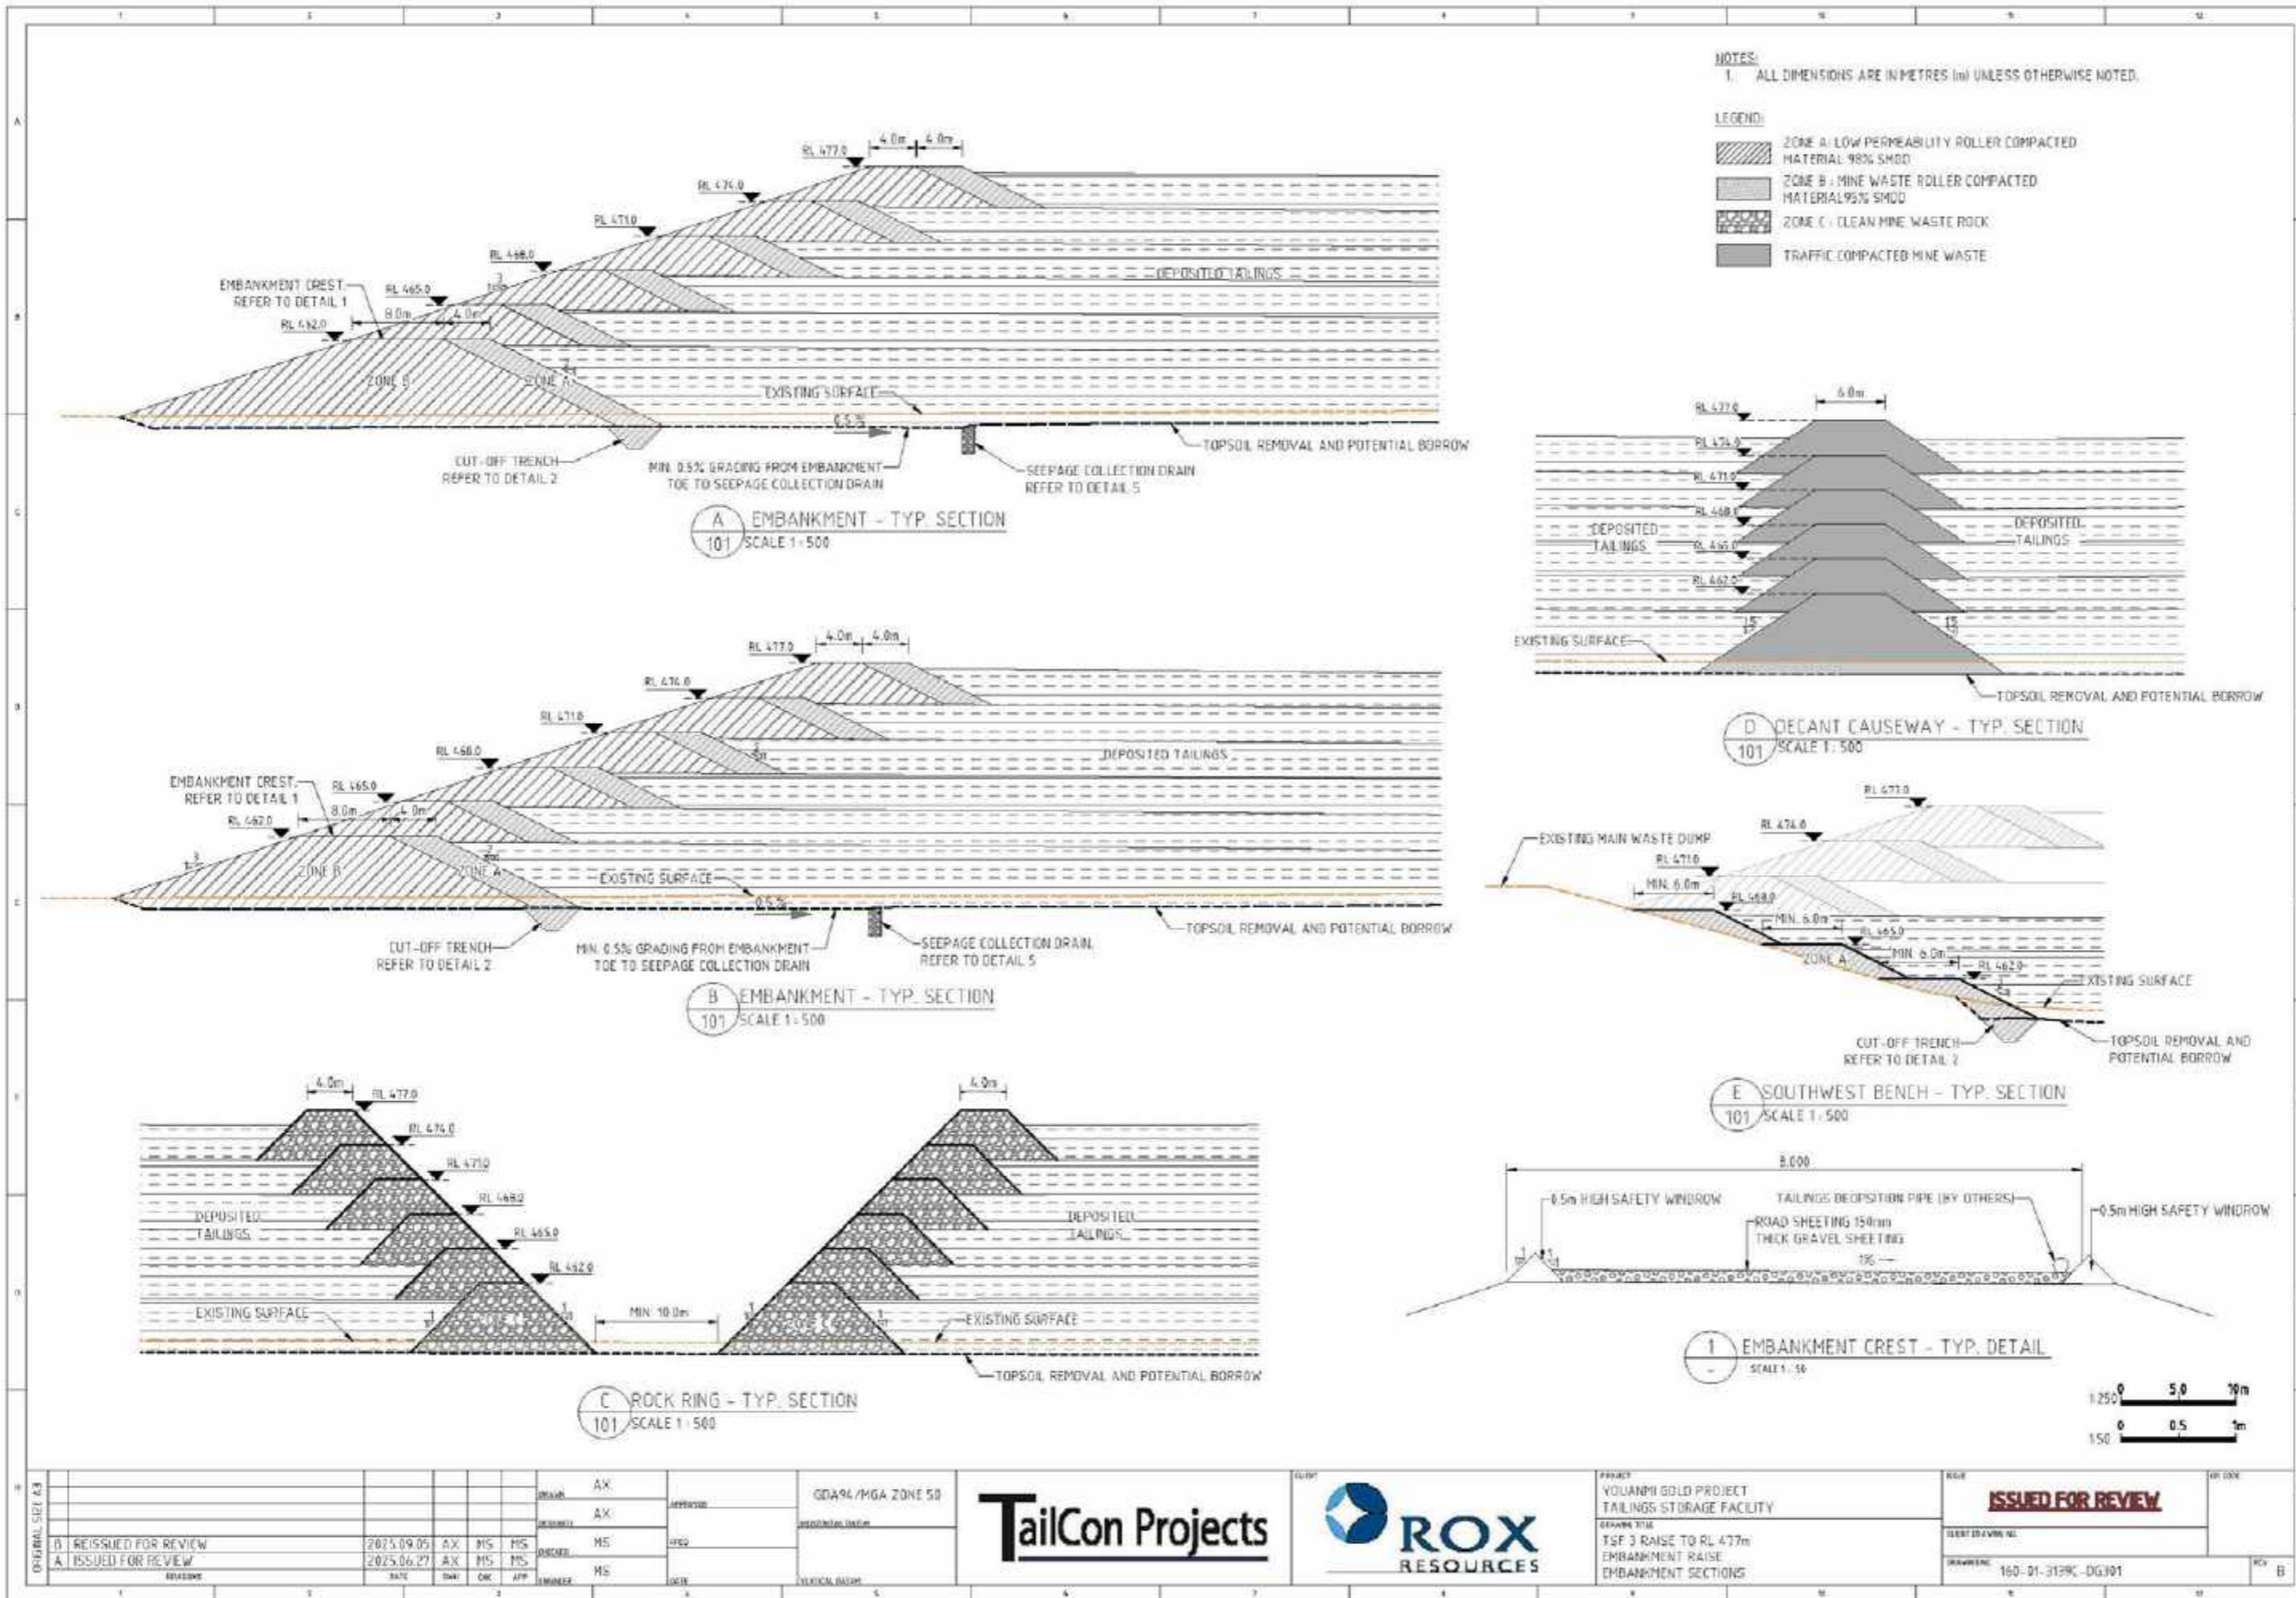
TSF3 - Embankment Sections (TailCon 2025a)
